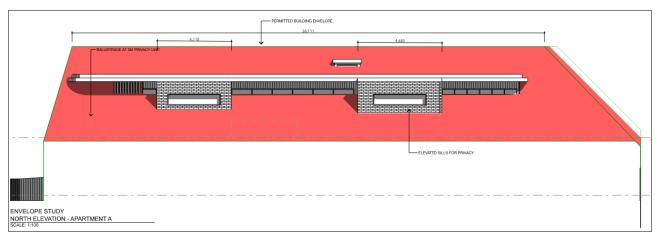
Building envelope study – north elevation (andrew smith architects, 2023)
